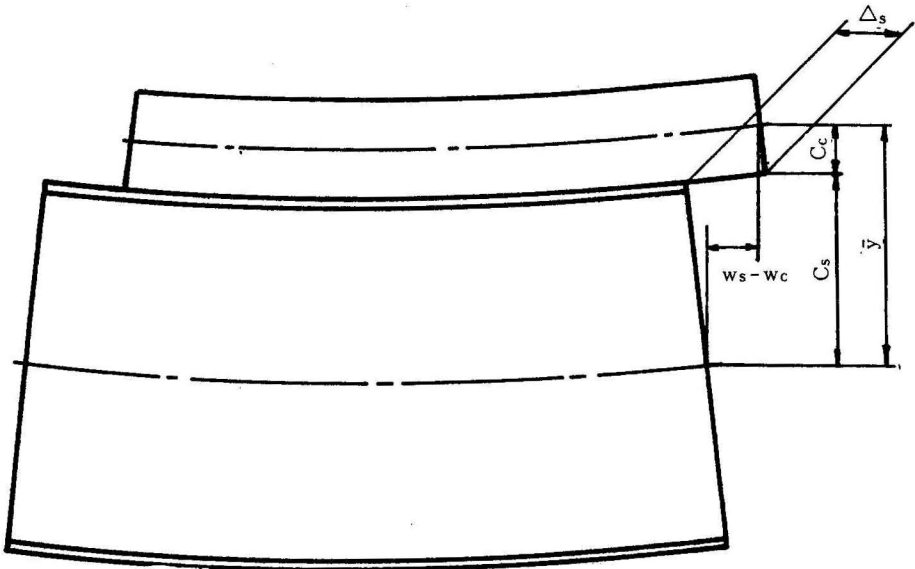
Slip between the Concrete Slab and the Steel Beam
